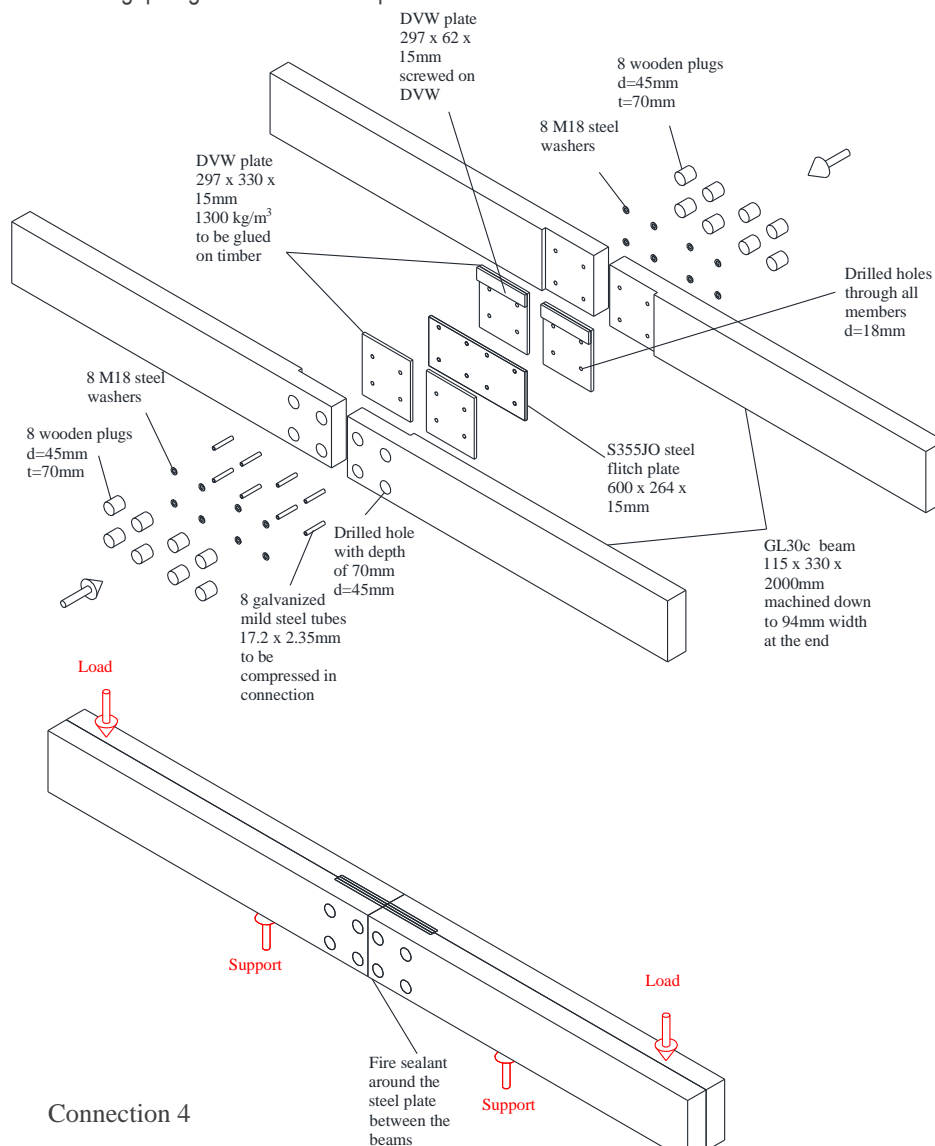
Exploded view of connection 4 (top) and assembled connection 4 (bottom)
